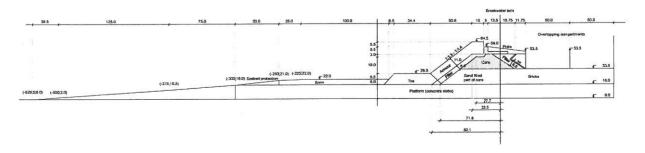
Cross section of the Zeebrugge breakwater model in scale 1:40.
